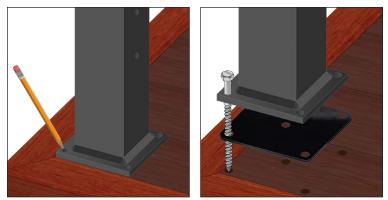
Figure C. (LEFT) When the final position is determined for the post, mark the hole locations of the four (4) 3/8" diameter mounting holes provided on the base and remove the post assembly.
